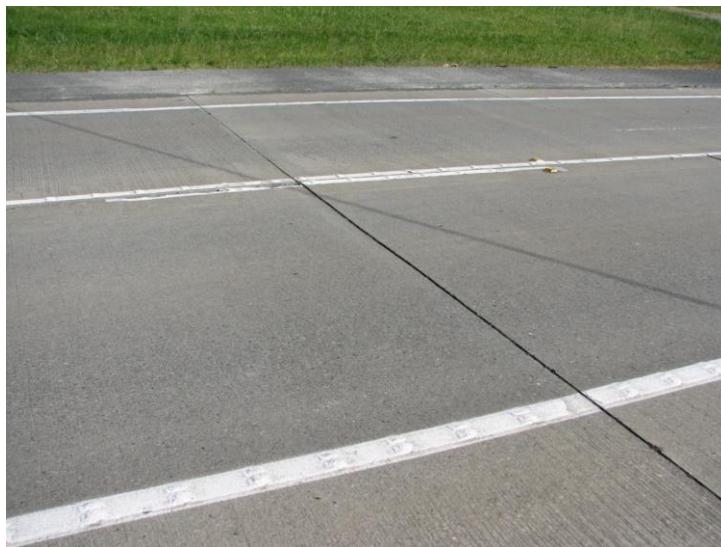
Joint faulting less than 5mm, 25 year old pavement constructed without SMZ on a flood plain with water table at subgrade level
